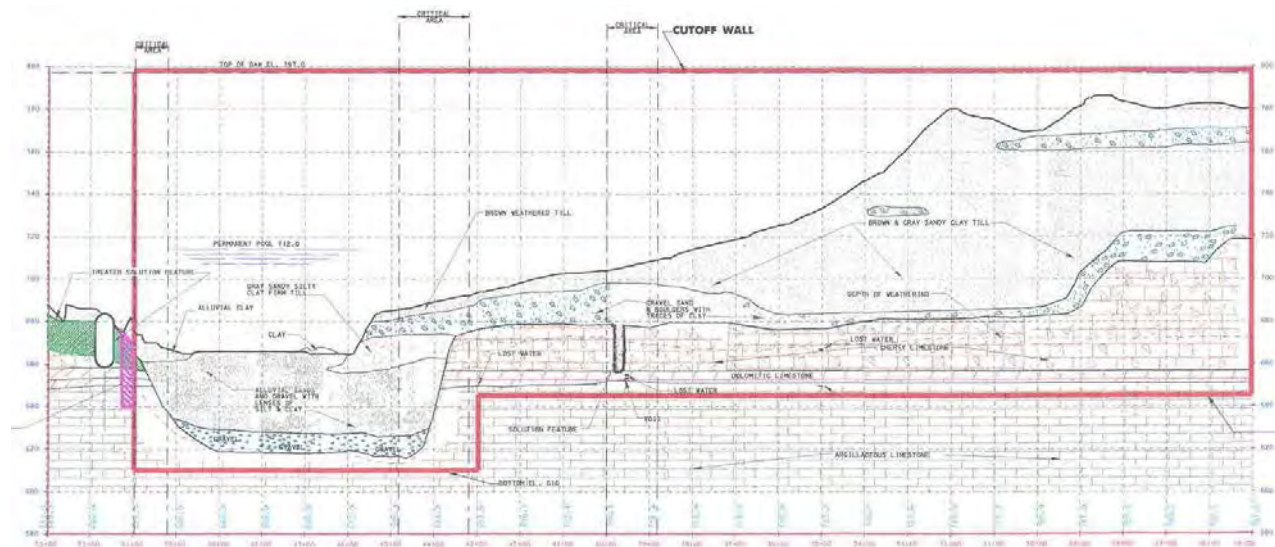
As-designed cutoff wall profile. Red line denotes the designed extent of the new cutoff wall. Vertical exaggeration is 5X.
